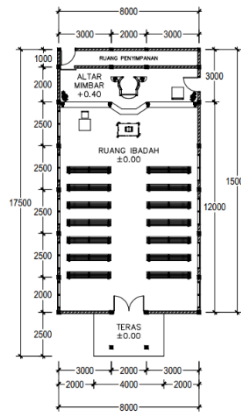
The layout of GIDI Jemaat Shallom Kwadeware/Dondai on Kwadeware Island
